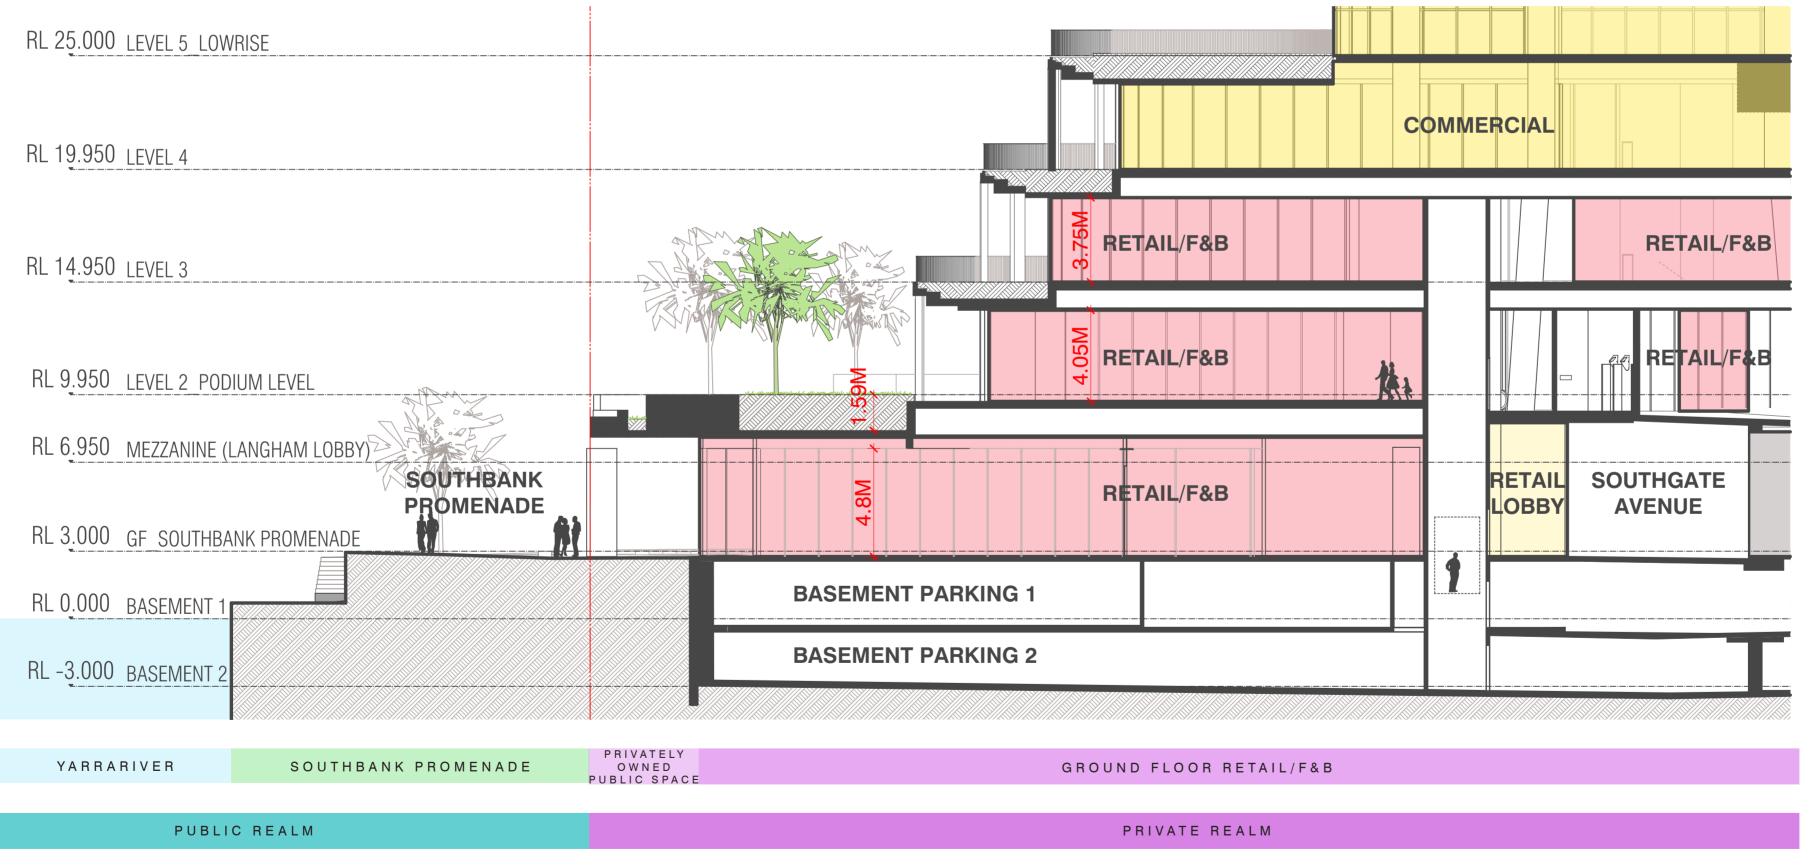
SECTION THROUGH MID BLOCK CONNECTION WITH RAISED GROUND LEVEL SLAB
